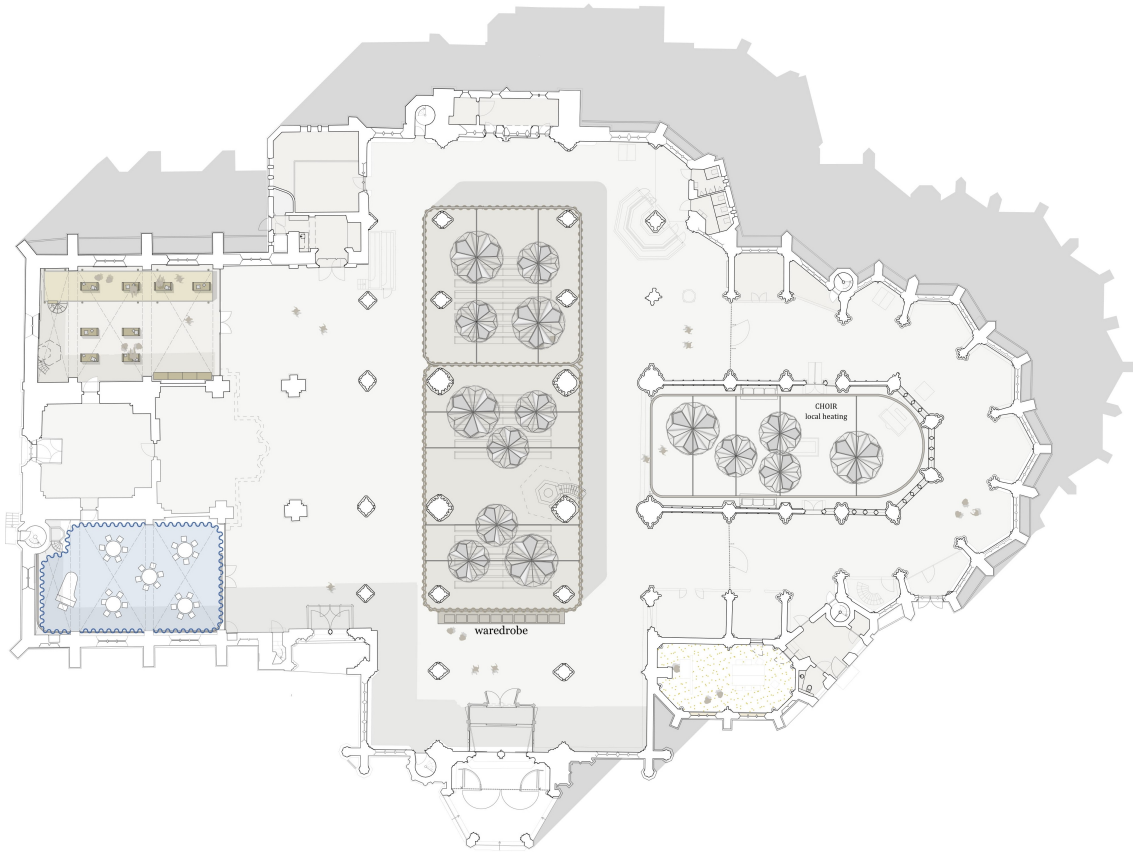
Floorplan Stevenskerk renovation proposal - Step 2
